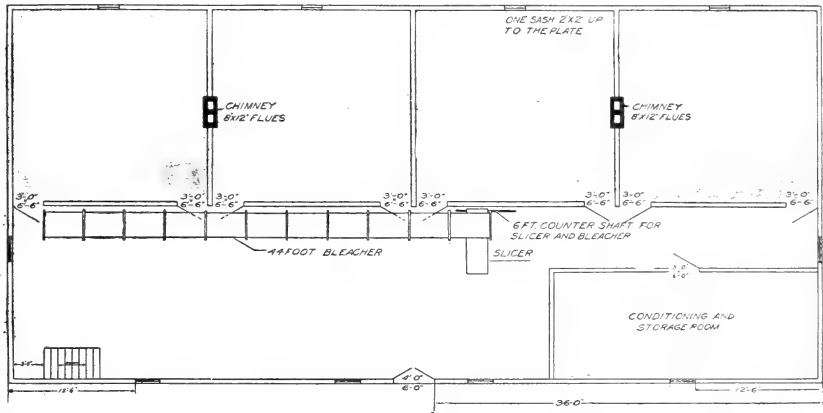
Second-floor plan of a 4-kiln drying plant. The drying floor and workroom are on the same level. The bleacher is hung from the rafters with sufficient headroom for passing into the kiln.
